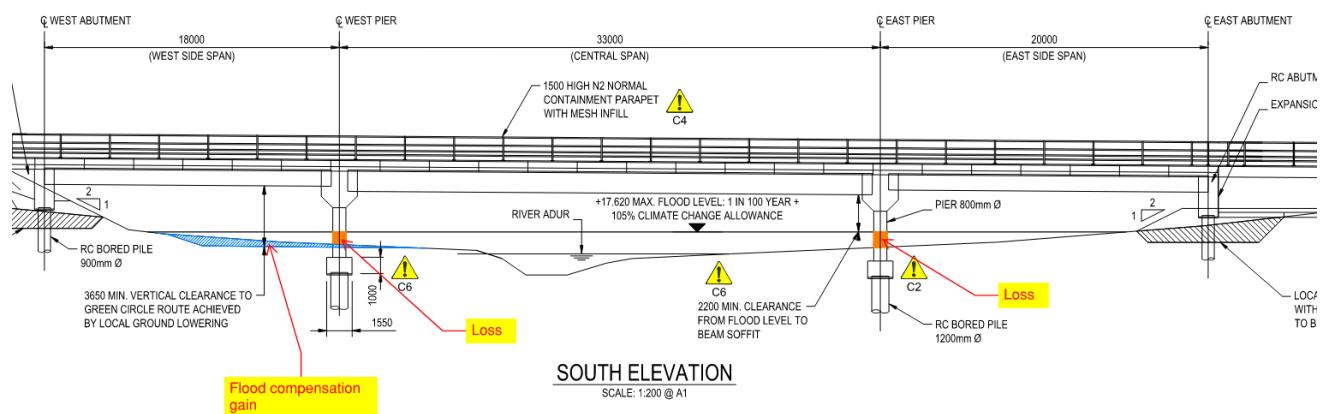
Bridge South Elevation with Indication of Loss Areas
